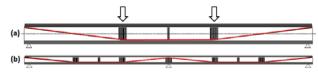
Draped tendon profile configuration – (a) Simply supported beam (b) Statically indeterminate beam
